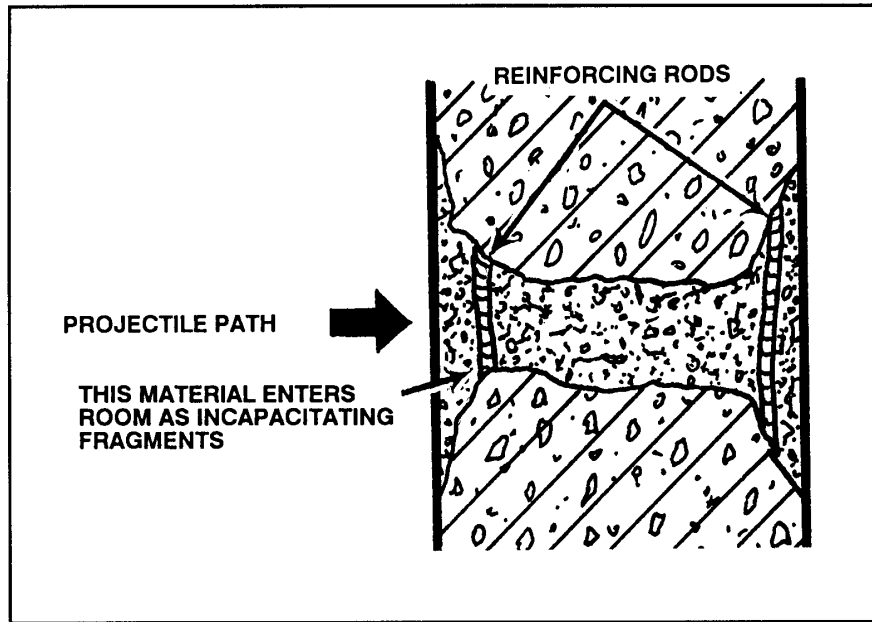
Tank HEAT round effects on reinforced concrete walls.
